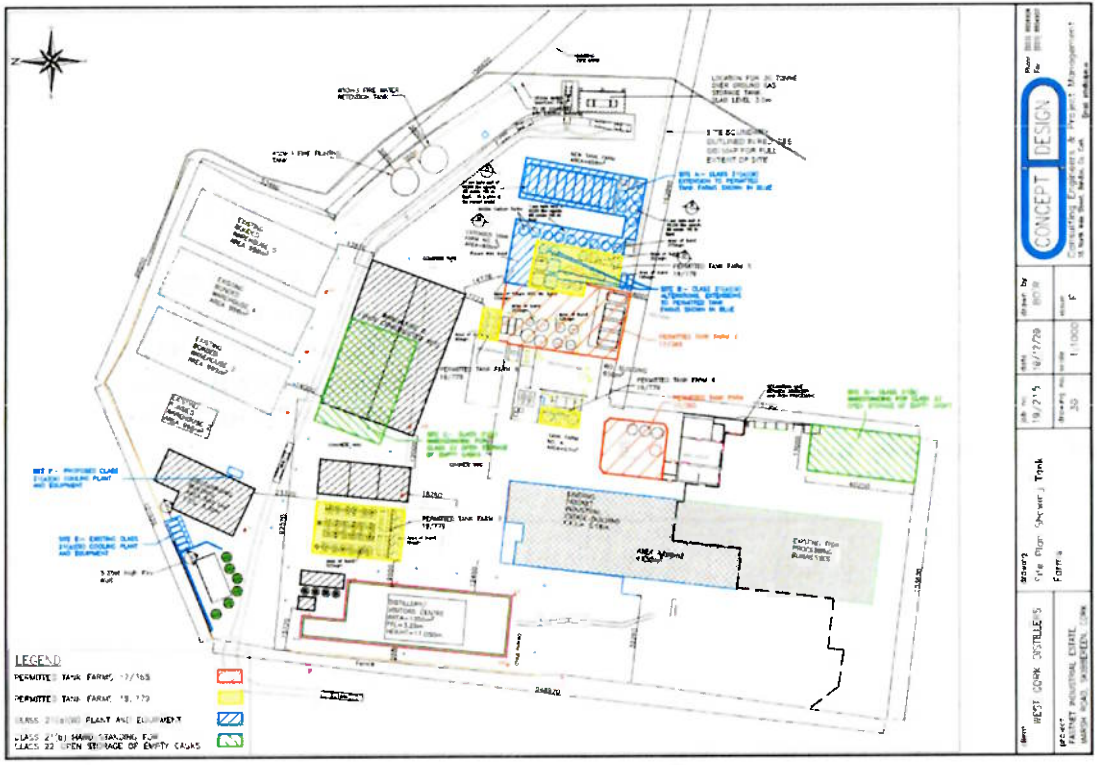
Development Site Boundary (Ref: Extracted from Planning Drawings)
